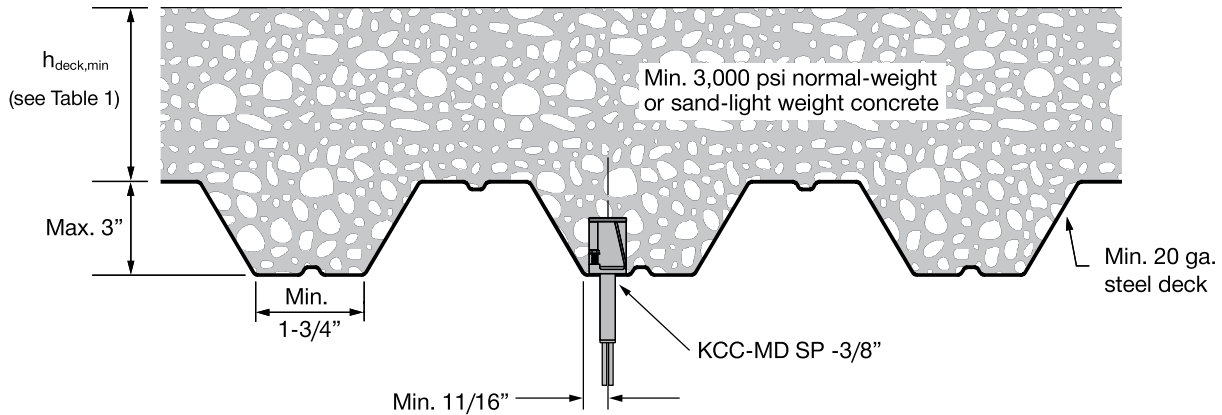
B — Installation of KCC-MD inserts in the soffit of concrete filled metal deck floor and roof assemblies-over lower flute (W-deck)
